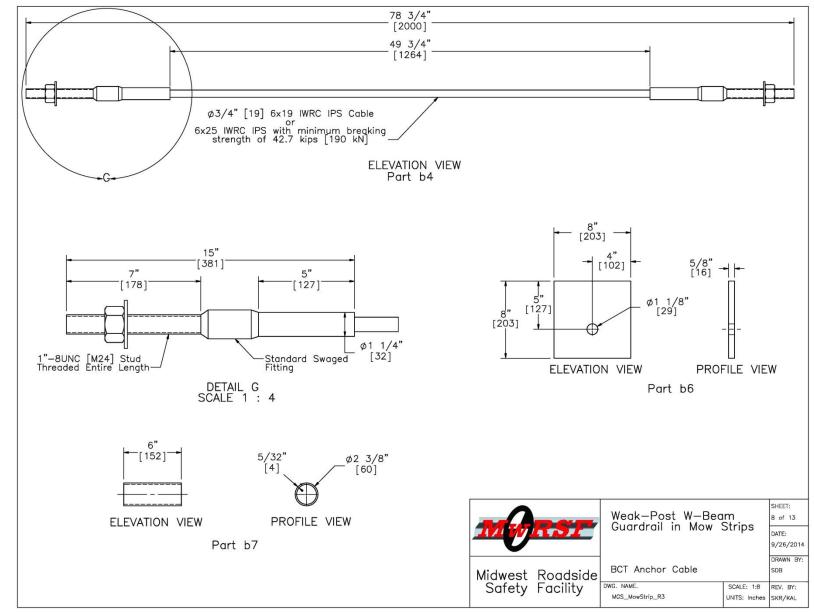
Cable Anchor Details, Test No. MGSMS-1
